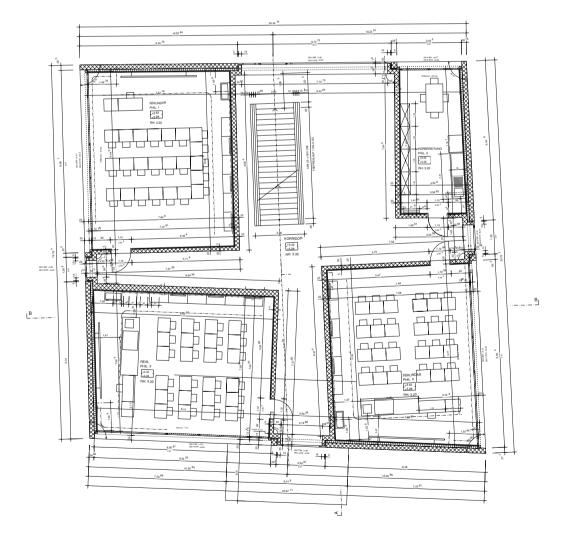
Plan of 1st floor, 1:200 1:50 working drawing (reduced)
